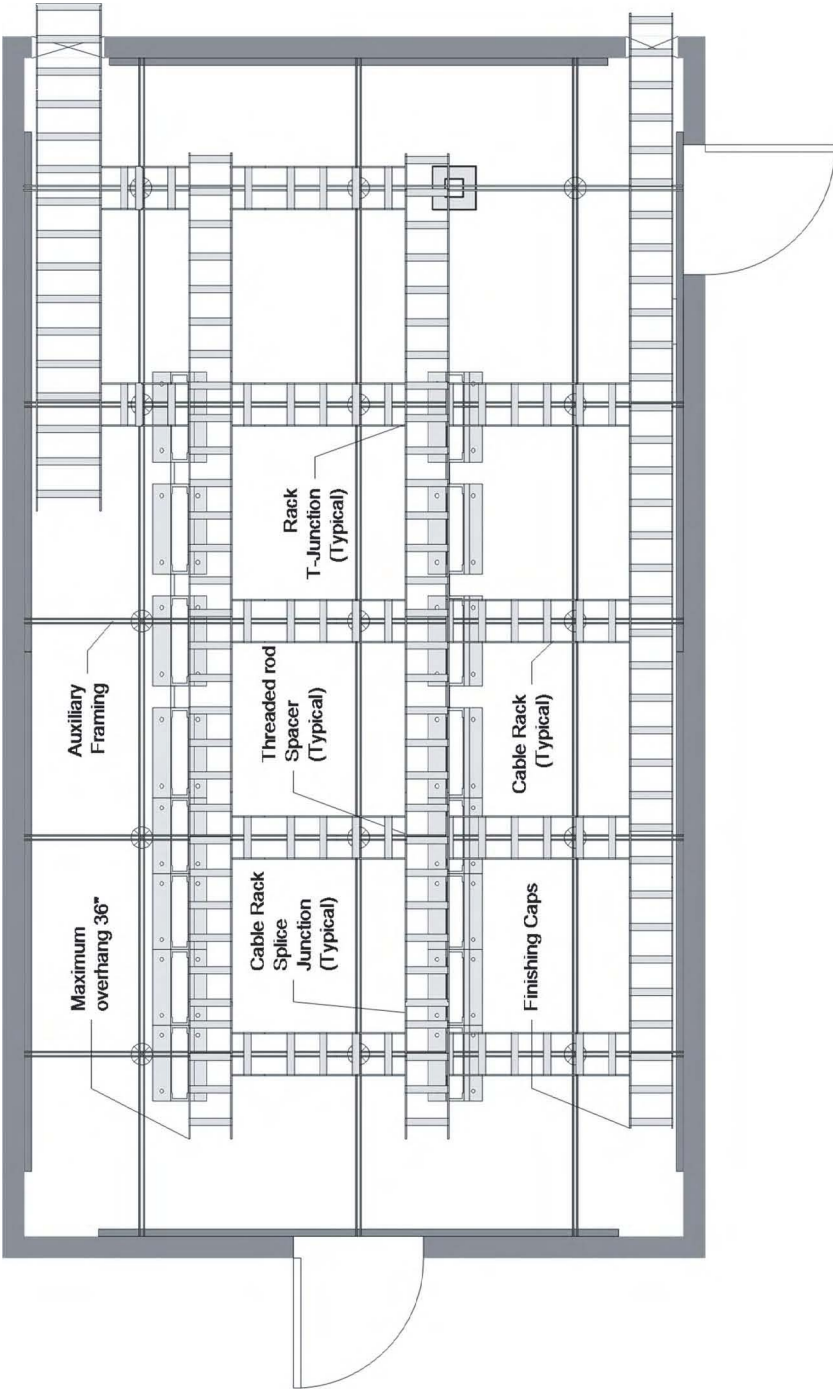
Plan view: Basic layout for cable rack fastened to auxiliary framing.
